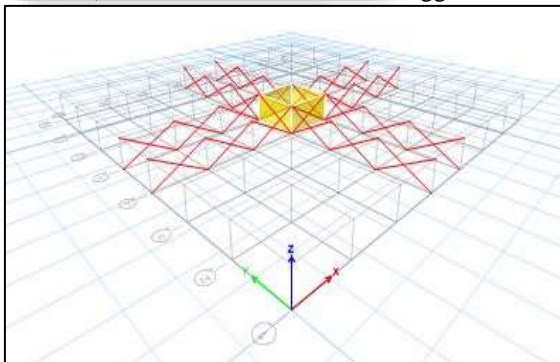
Perspective view of a storey of Building Model 6 (With Steel X Outriggers)
